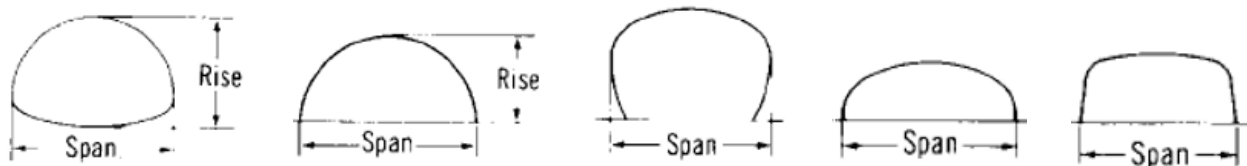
Typical Arched Buried Corrugated Steel Structure Shapes
